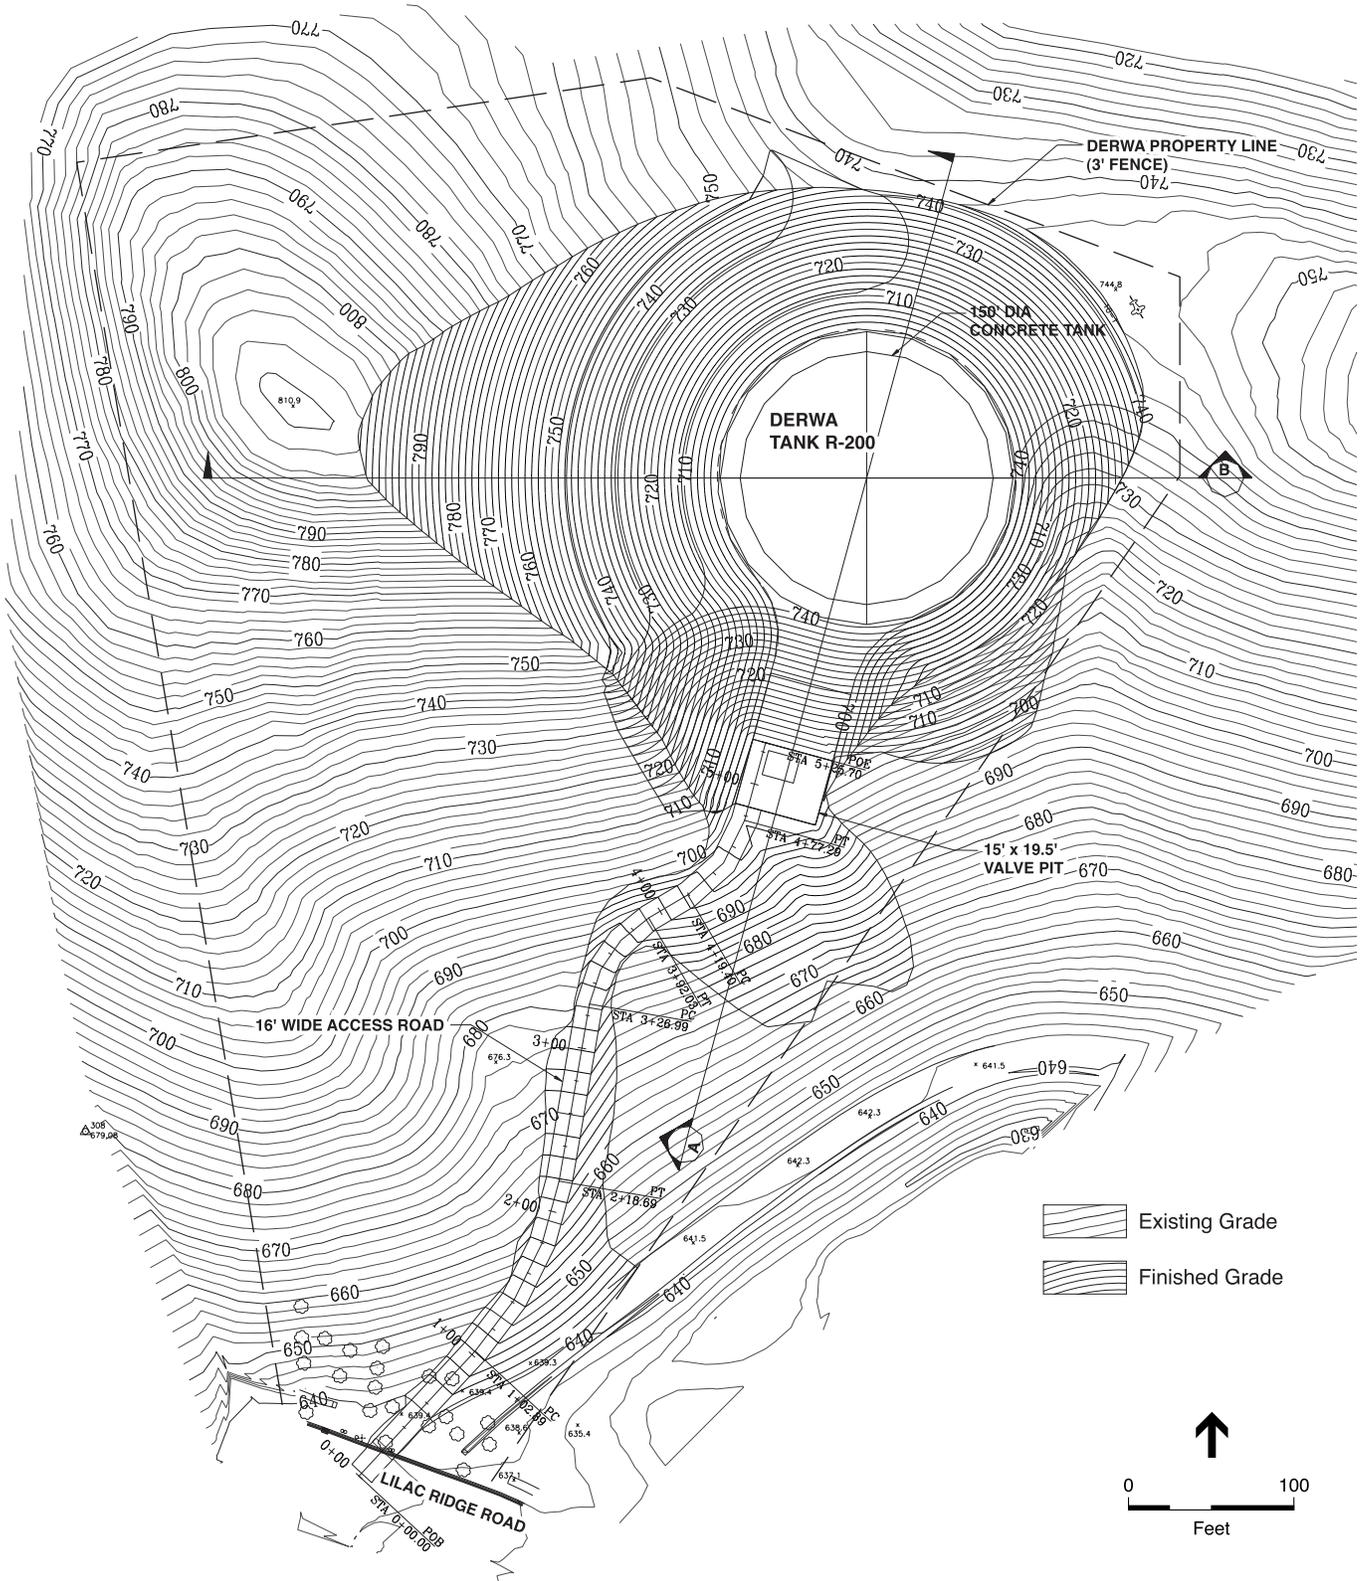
and 4 show the plan view and cross sections of the reservoir tank. The proposed reservoir would be a cylindrical prestressed concrete tank, 150 feet in diameter, placed on excavated bedrock materials. The tank would then be completely buried using select native backfill (totaling approximately 75,000 cubic yards). DERWA would construct stairs (not shown on Figures 3 and 4) on the exposed slope between the valve pit and the top of the reservoir. A three-foot high antenna would be located near the top of the stairs. A 16-foot wide access road would be constructed from Lilac Ridge Road to the tank (see Figure 3). Around the property, a three-foot high barbed wire fence, similar to existing cattle fences in the area, would be installed. A taller, six-foot high chain link fence around the paved valve pit area would also be installed. A temporary haul route traversing the tank site and the adjoining site would be used to move and stockpile the excavated materials.
